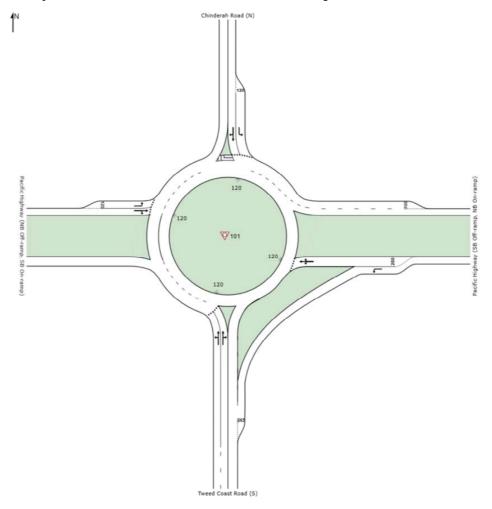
Pacific Highway / Tweed Coast Road SIDRA Intersection Layout
